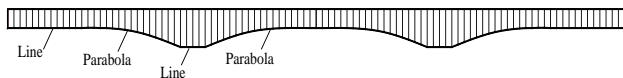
FIGURE III. ELEMENT ARRANGEMENT OF THREE-SPAN CONTINUOUS BOX GIRDER.
